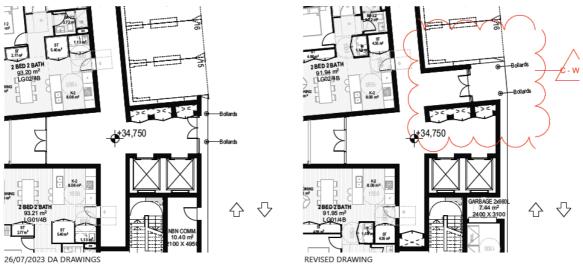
Revised door location to provide entry lobby to the carpark in Building B
